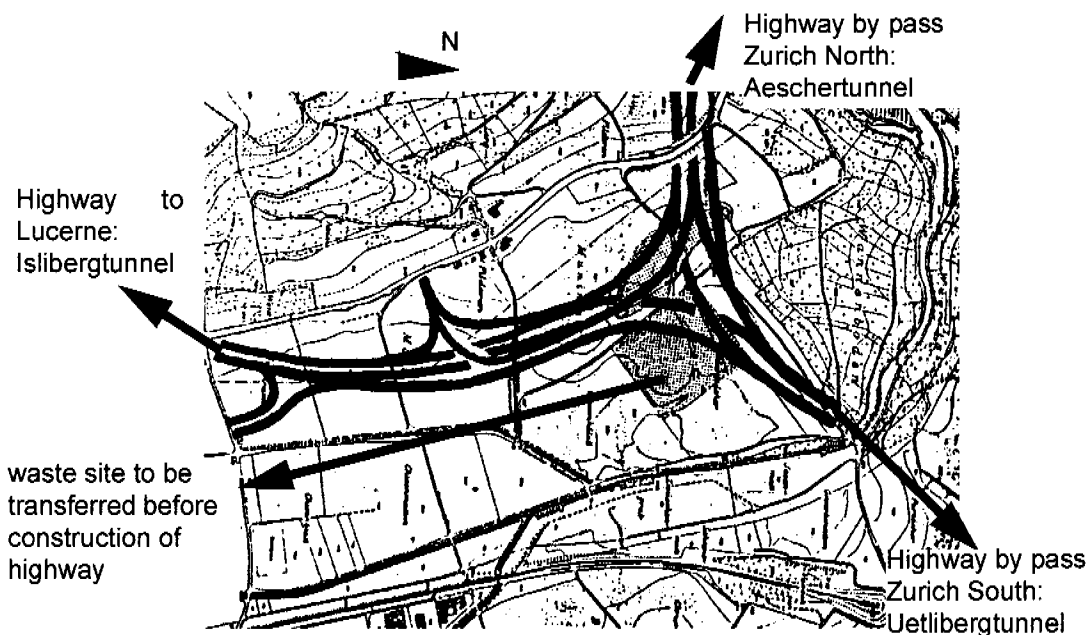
Layout plan of the highway intersections in Birmensdorf.
